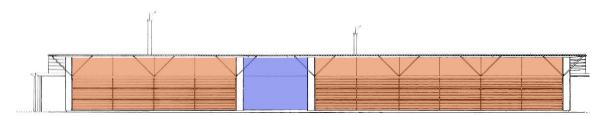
North Elevation. The Magney House is located in a harsh environment, and uses many features to work with its site. This north elevation shows the house's breezeway in blue. The breezeway provides passive ventilation.
